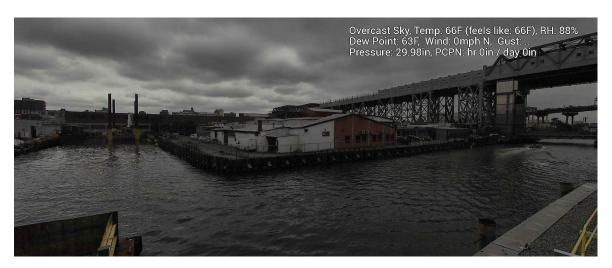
May 29, 2025. General Conditions in Canal north of 9th Street Bridge near TB7 during in-waterway construction activities.
